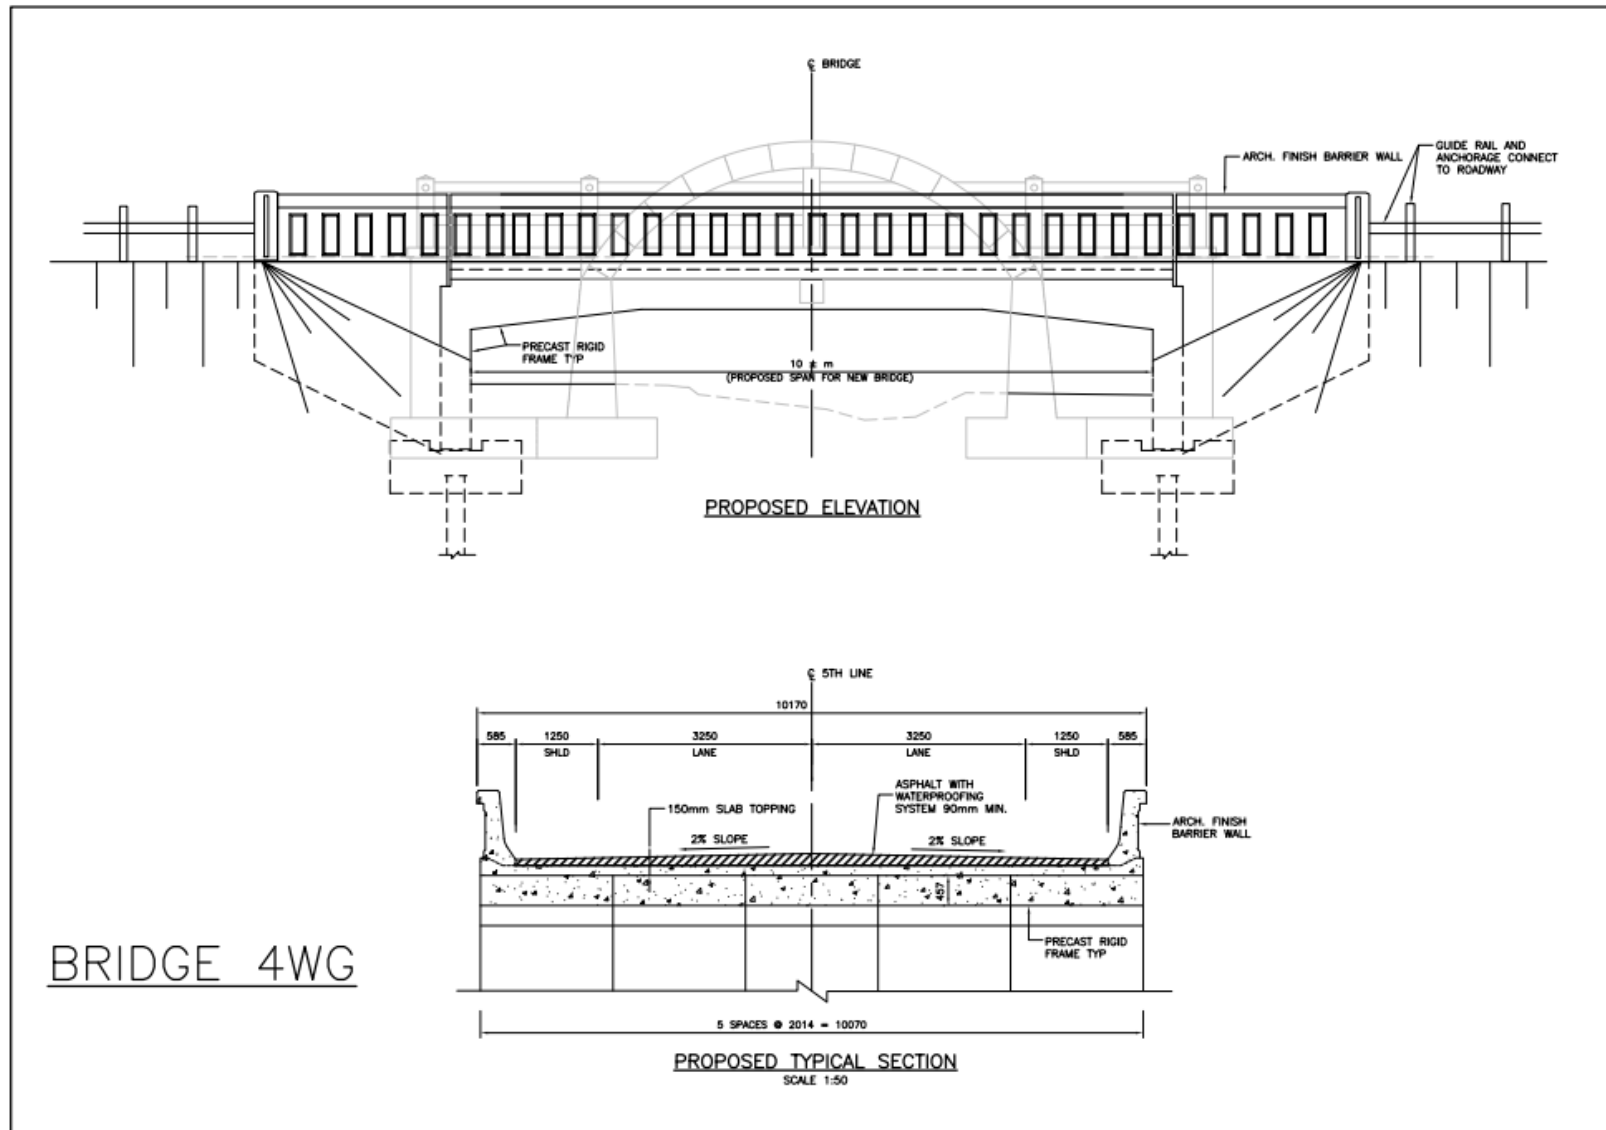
Bridge 4-WG Proposed Elevation and Proposed Typical Section (CIMA Canada Inc. 2019)
